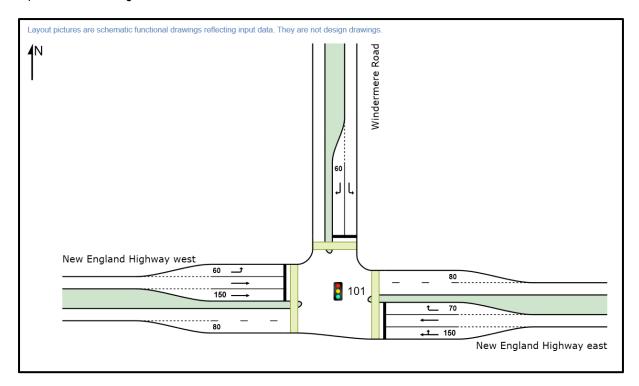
Indicative future traffic signal layout at Windermere Road and New England Highway
